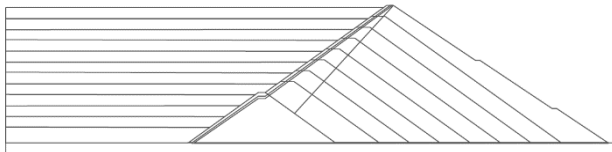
Typical cross-section of mine TSF dam case study 1. Source: (Eldridge, Moffitt, Botts, and Dechert, 2014).
